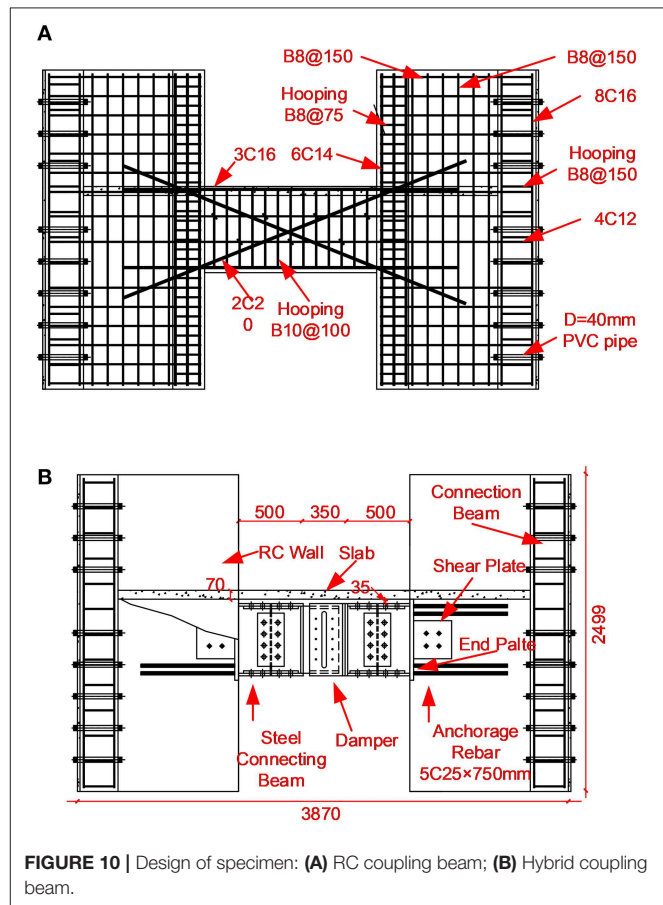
| Design of specimen: (A) RC coupling beam; (B) Hybrid coupling beam.
